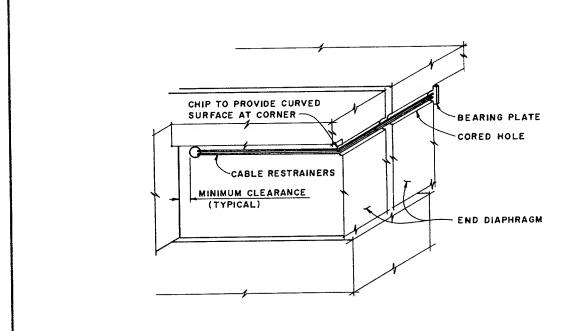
Expansion Joint Retrofit Detail for Concrete T Beam (from Reference 5)
